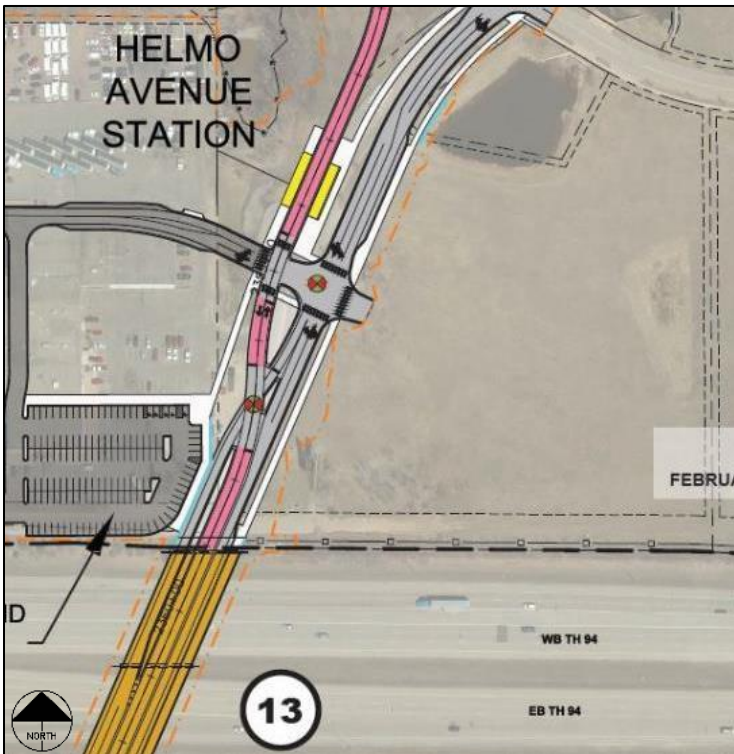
30% DESIGN NORTH OF I-94 AT 4TH STREET AND HELMO AVENUE (MN PIPELINE)
